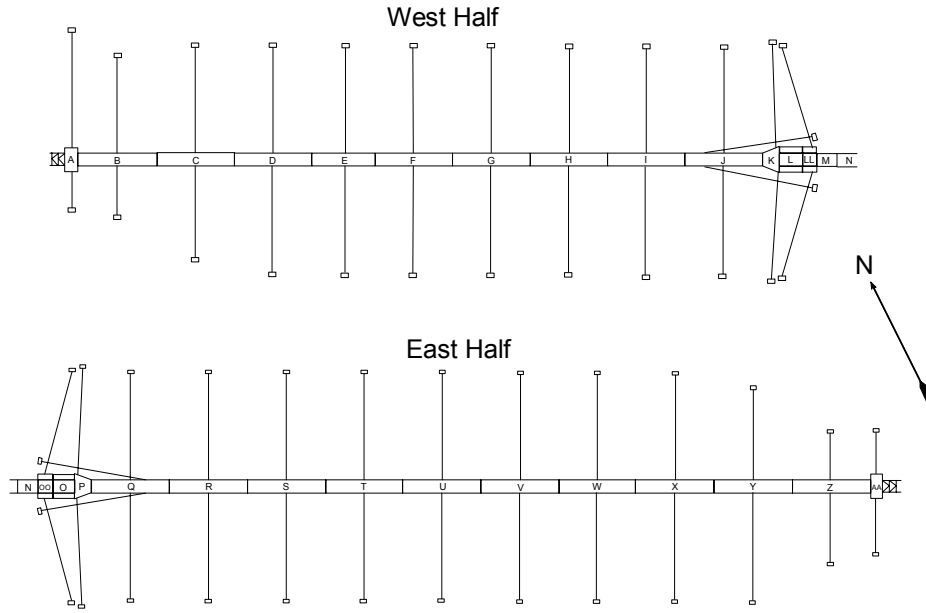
Plan View of the Evergreen Point Floating Bridge
